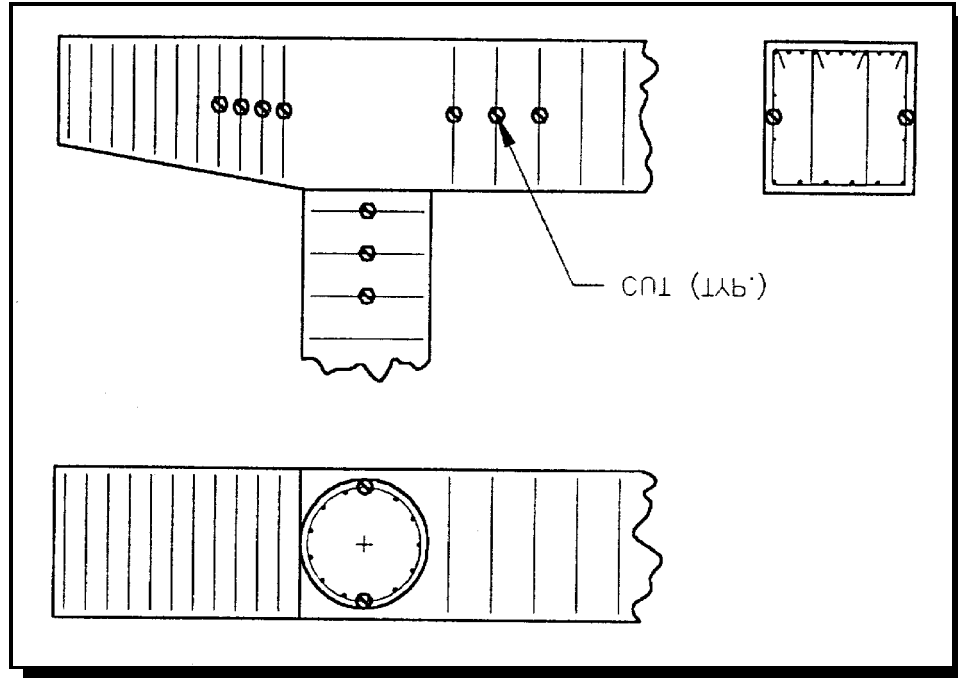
Exposed view of stirrups showing cut positions. (Scale 1:60).
